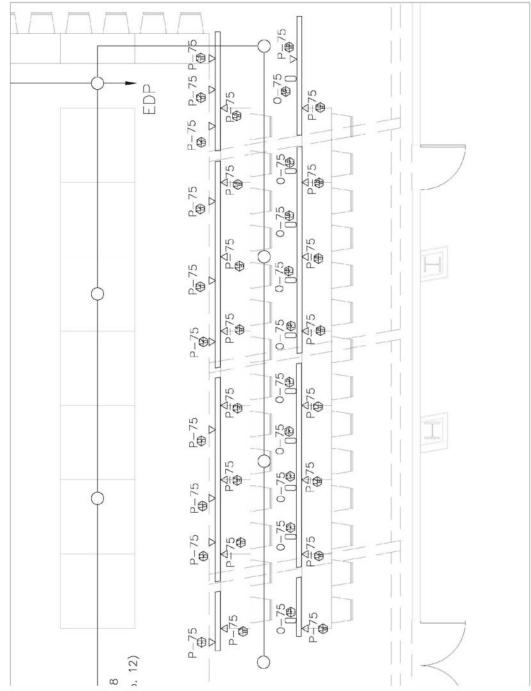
Showroom – Lighting Plan Rows 3 and 4
